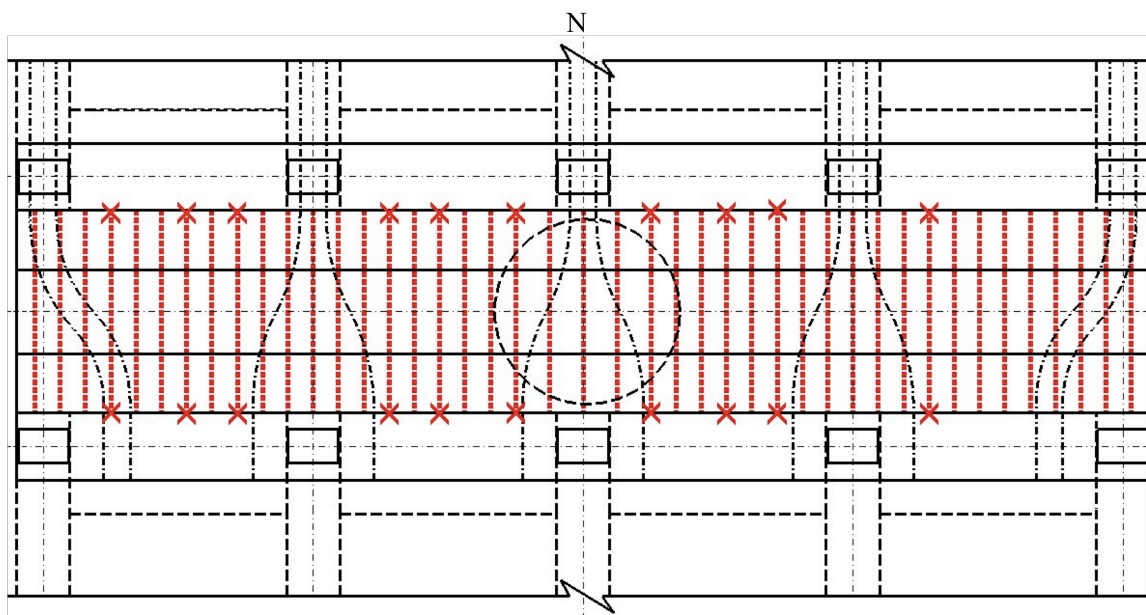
Cap Beam Inner Stirrup Strain Gauge Layout
